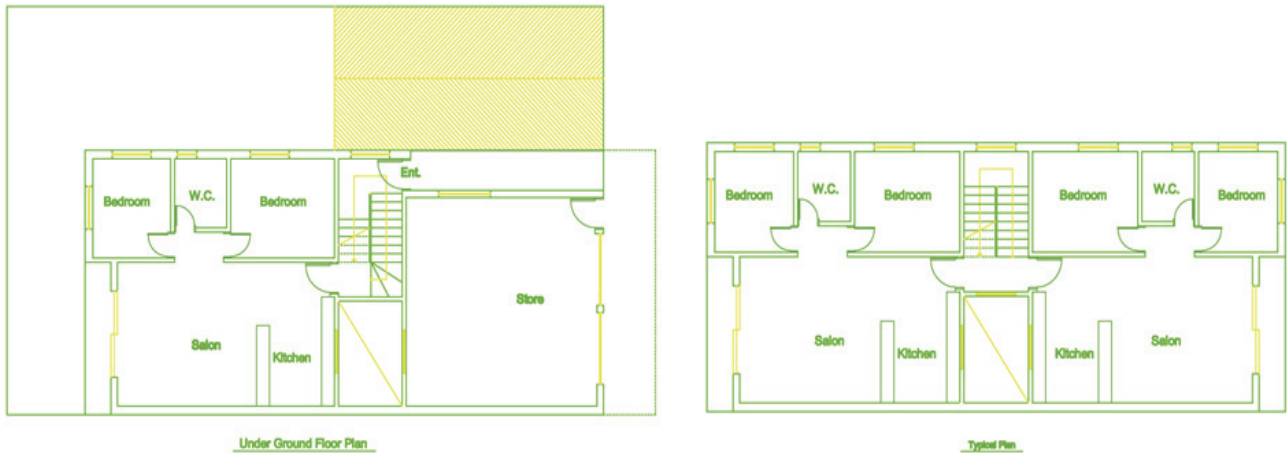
Halil Raif Özmuhtar Apartment plans (Drawn by Authors)
